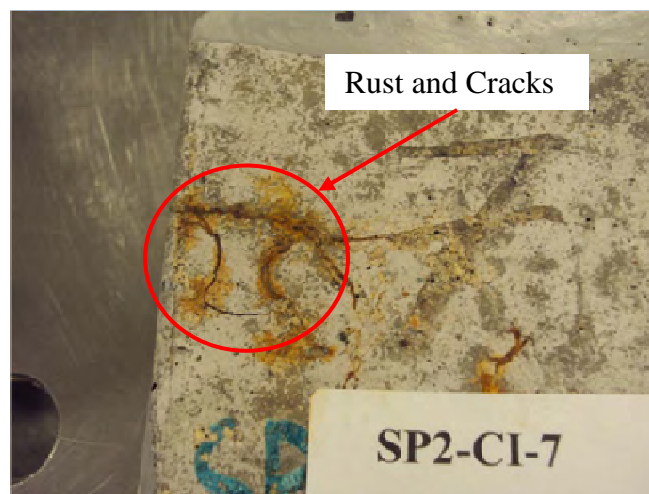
Rust and cracks on specimen SP2-CI-7
